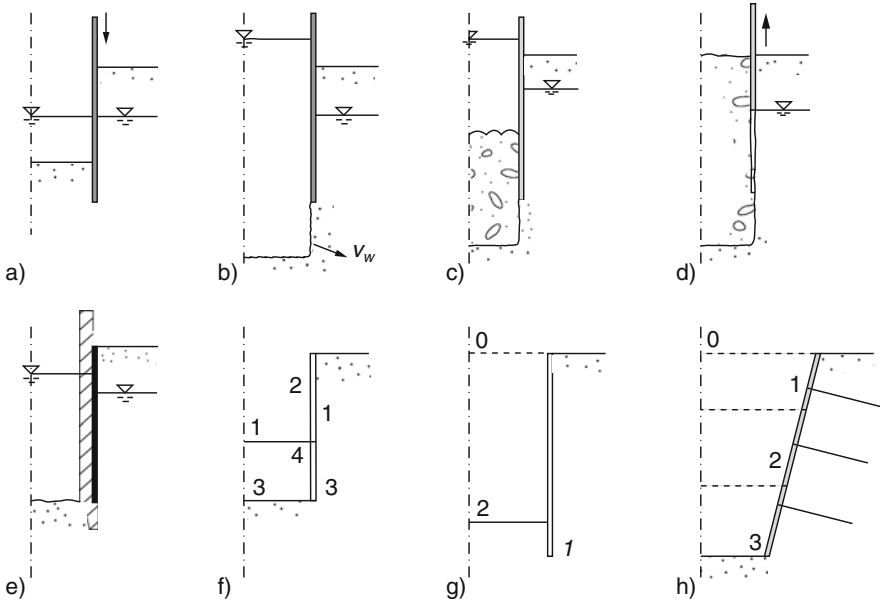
Supported holes in psammoid ground: casing without (a) and with seepage (b), concrete mud before (c) and during removal of casing (d), concrete tube with clay smear (e), cylindrical concrete wall after excavation (f), cylindrical trench wall (g), shotcrete and nails around conical hole (h). Numbers for sequence
